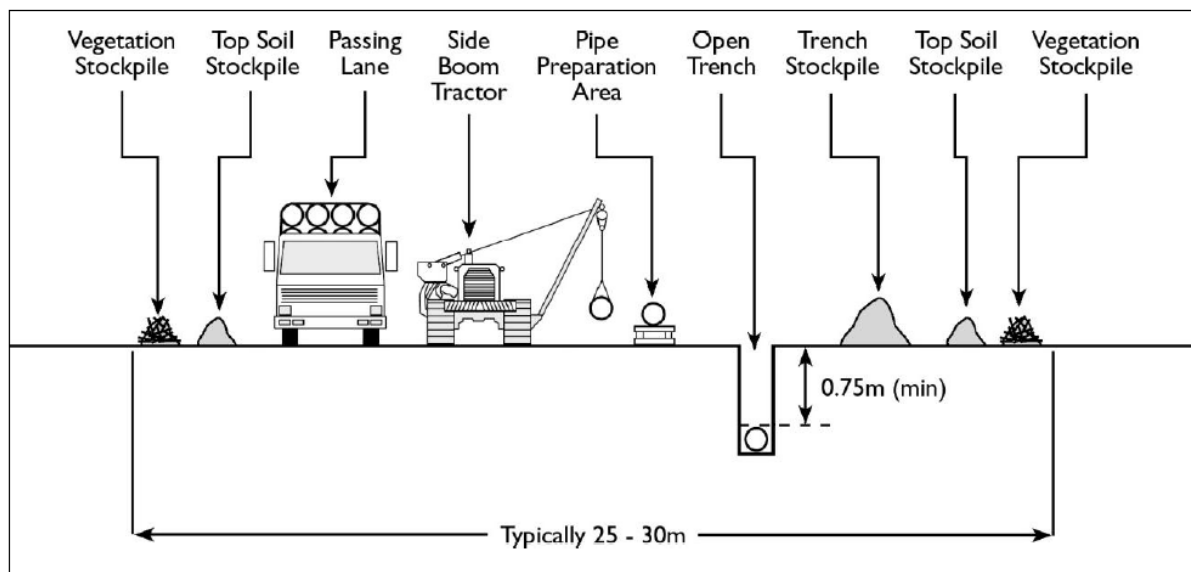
Corridor layout for Construction Phase (Source: APGA)
